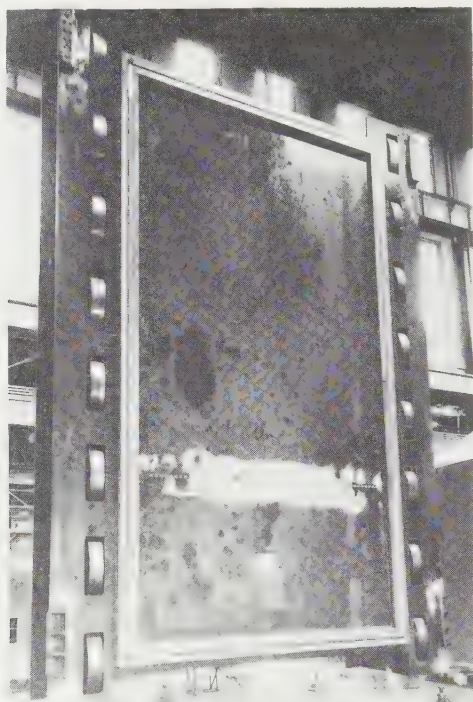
Downstream view showing wheel and seal arrangement on 9.93- by 18.98-ft wheel-mounted, all-welded gate for Yellowtail Dam.
